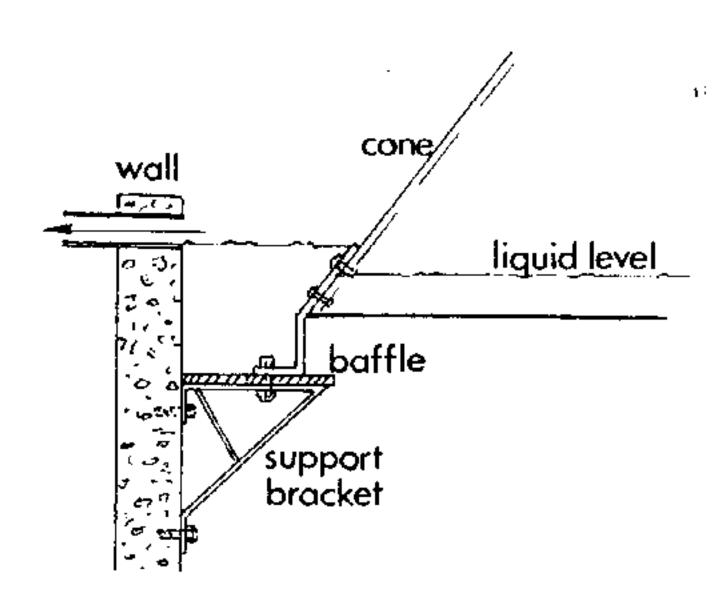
Details of construction of UASB digester - baffle and cone assembly.
